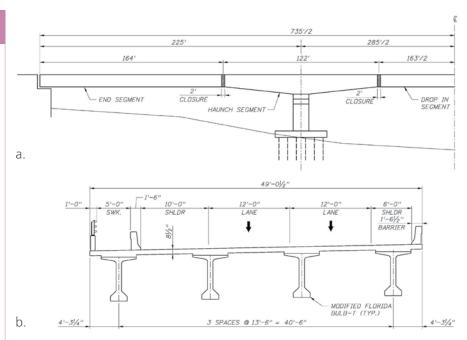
Cross Florida Barge Canal Bridge, (a) Elevation, (b) Cross Section (1'=305 mm, 1"=25.4 mm)
